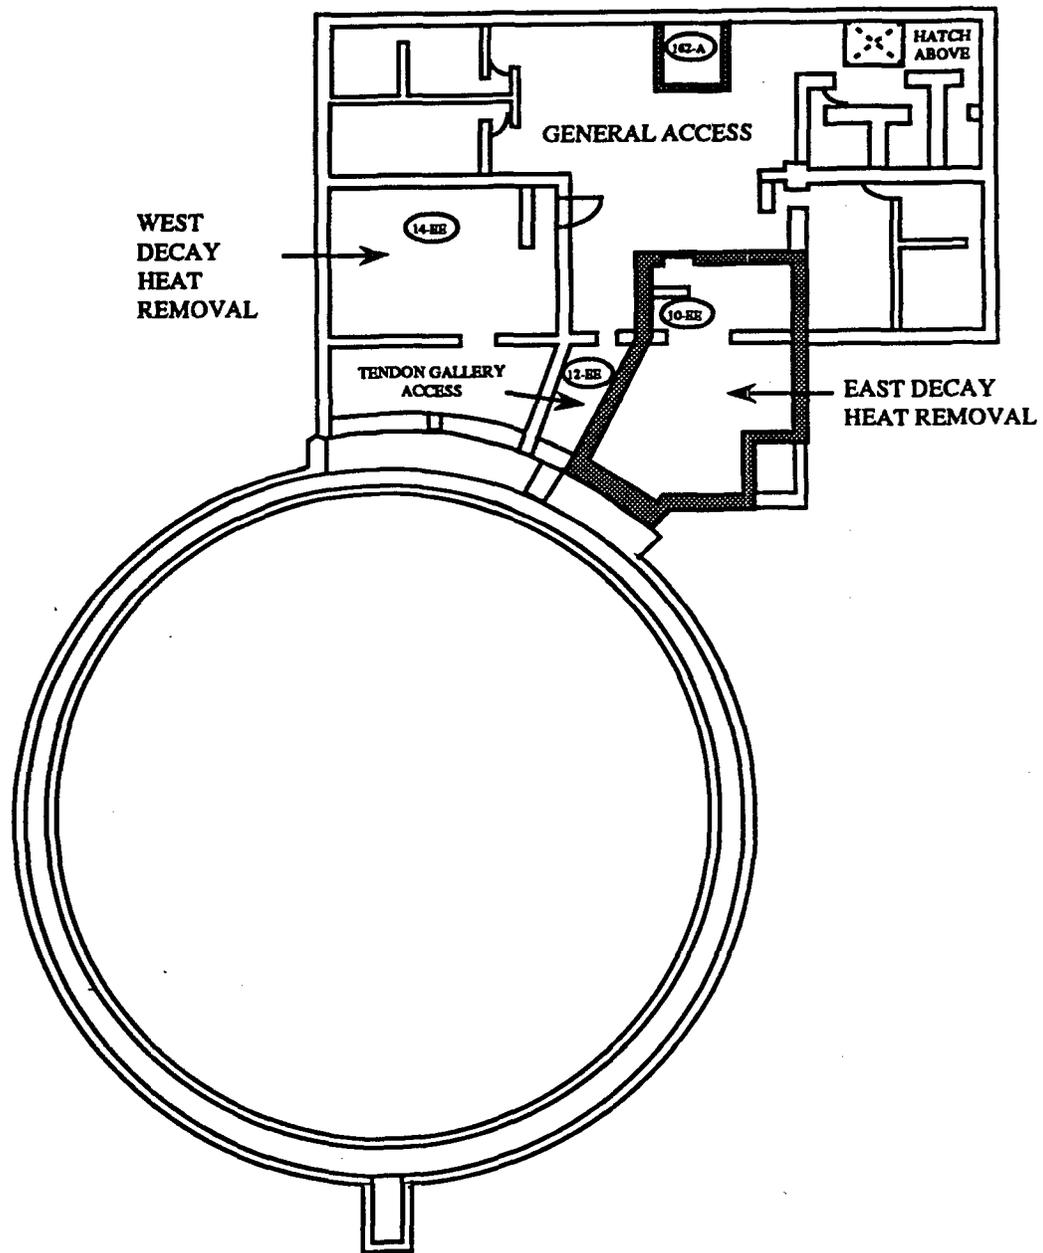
FIRE ZONES ON ELEVATION 317'
